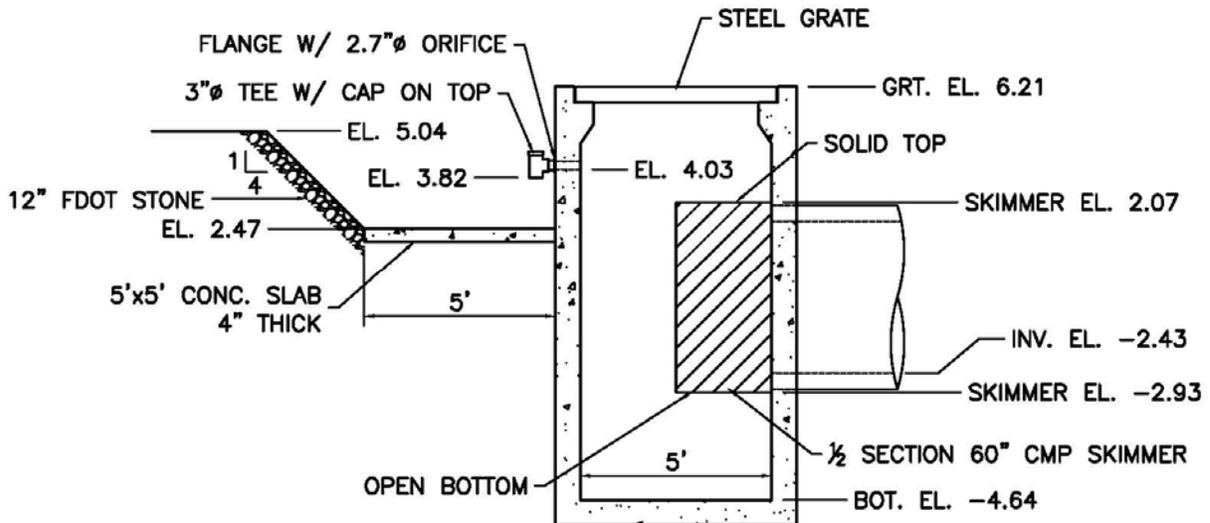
Overview of the Outfall Structure for Pond 2 at the Pembroke Pines Site.
